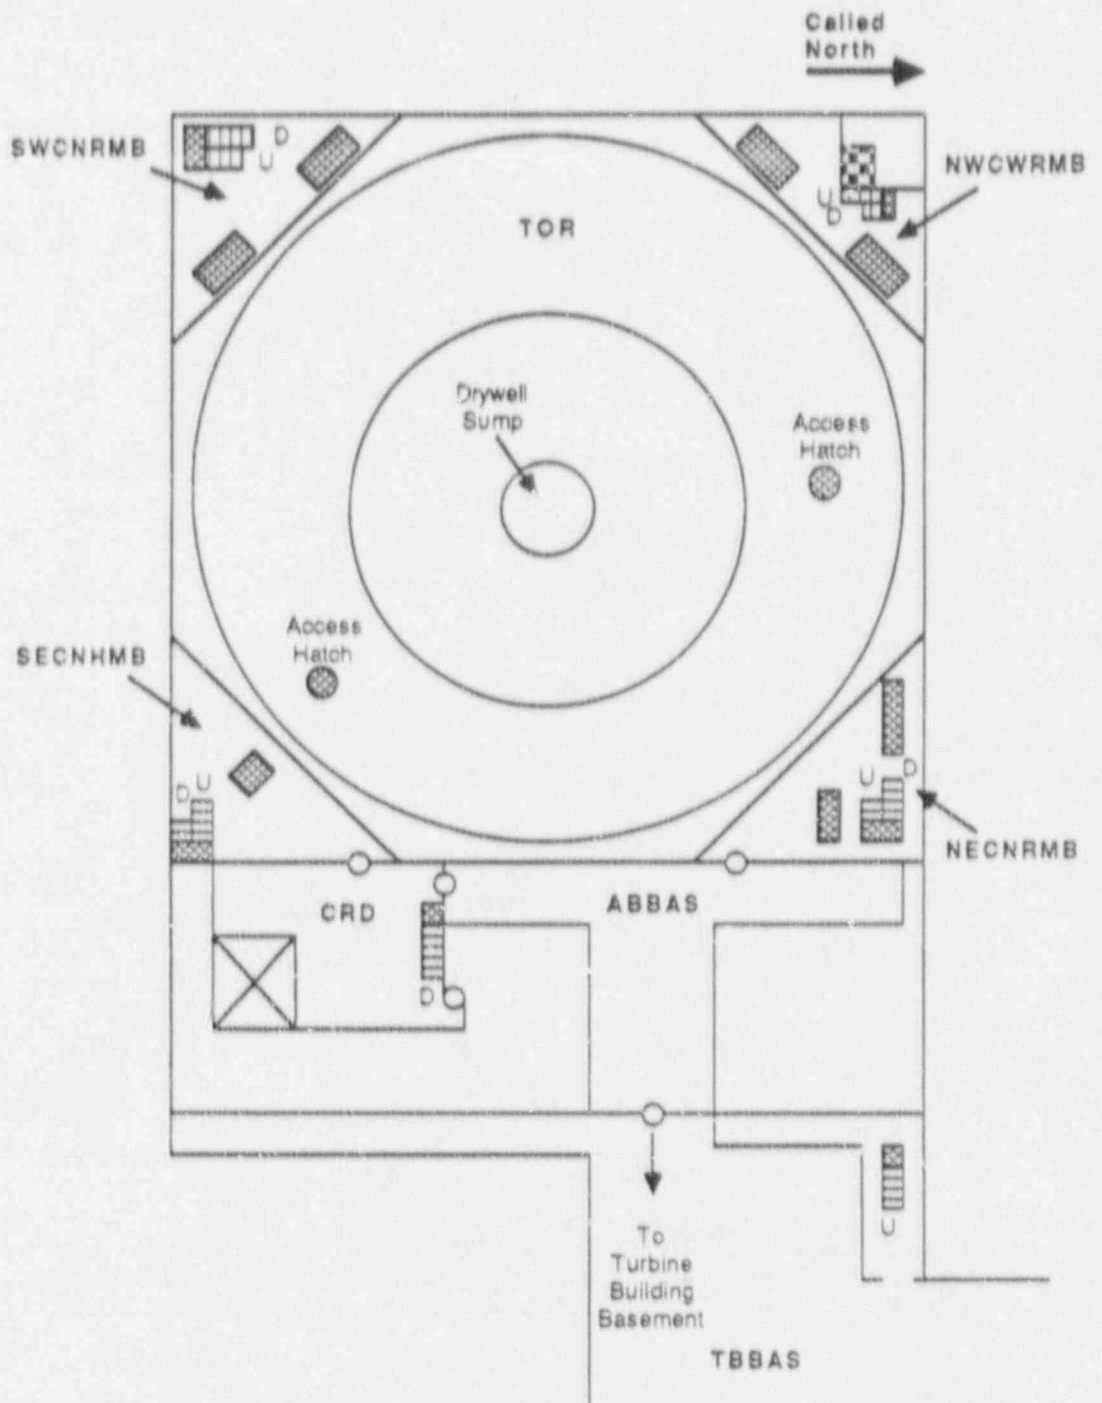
Enrico Fermi Unit 2 - Reactor Building and Auxiliary Building - 562 ft. Elevation
